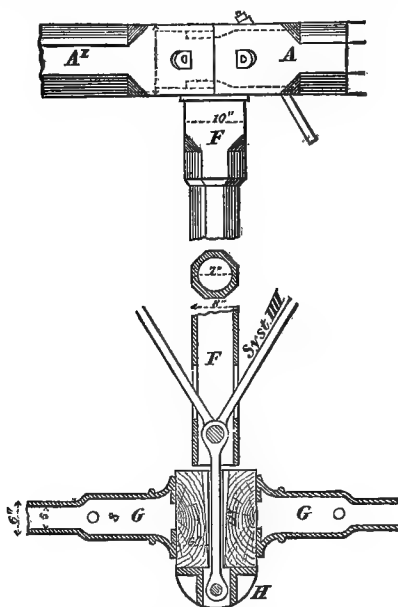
Post-and-Chord Connections, Fink Truss.
